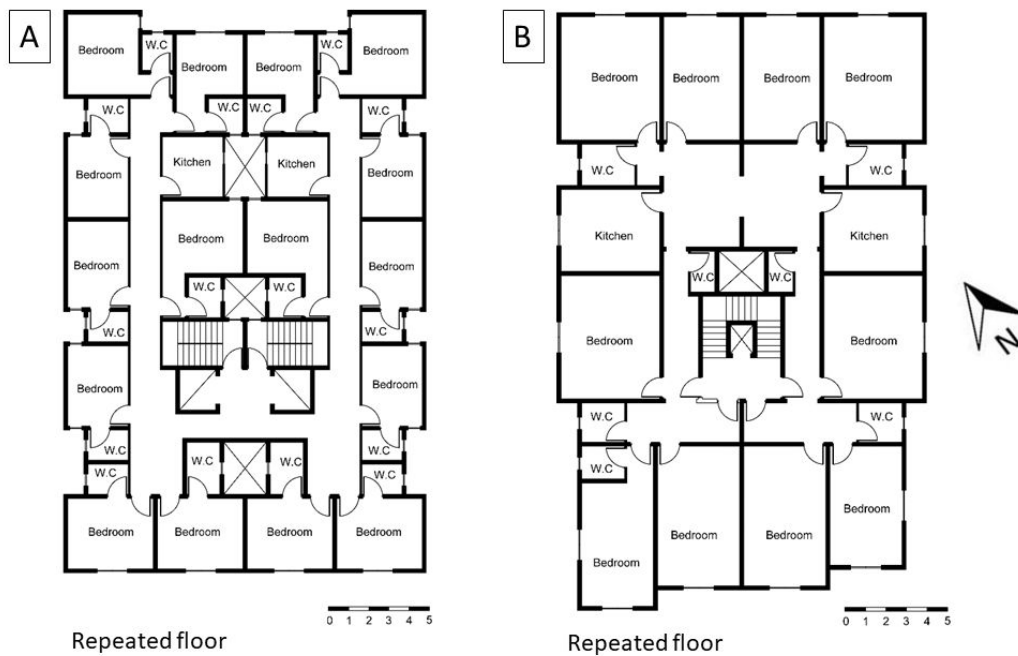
A. Architectural drawing of the repeated floor in first case study building. B. Architectural drawing of the repeated floor in second case study building.
